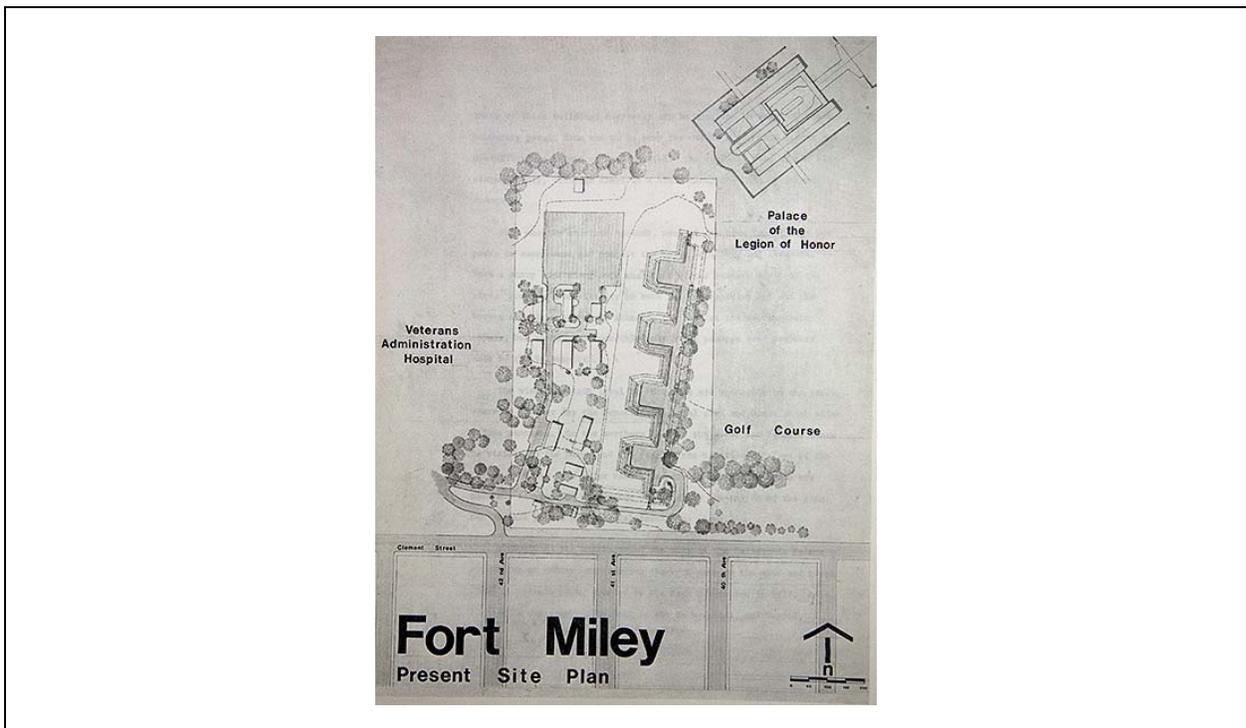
Site plan of East Fort Miley, 1968. (San Francisco Public Library)
